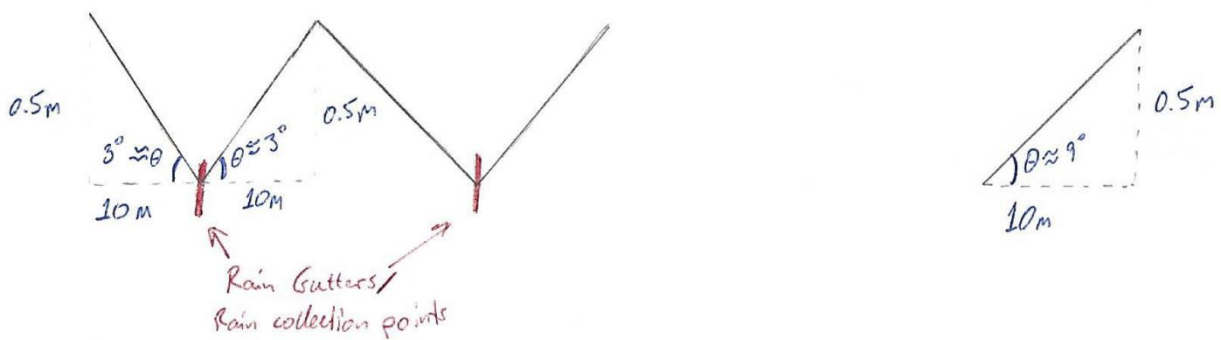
Cross-sectional views of roof design at Holmen (H8-H11 & H18-H21 (left) H12 (right)). The red lines show how the water runs off from the roof (the rain gutters). It should also be pointed out that the cross-sectional views are not drawn to scale, they are instead exaggerated to help illustrate the angles and lengths.
